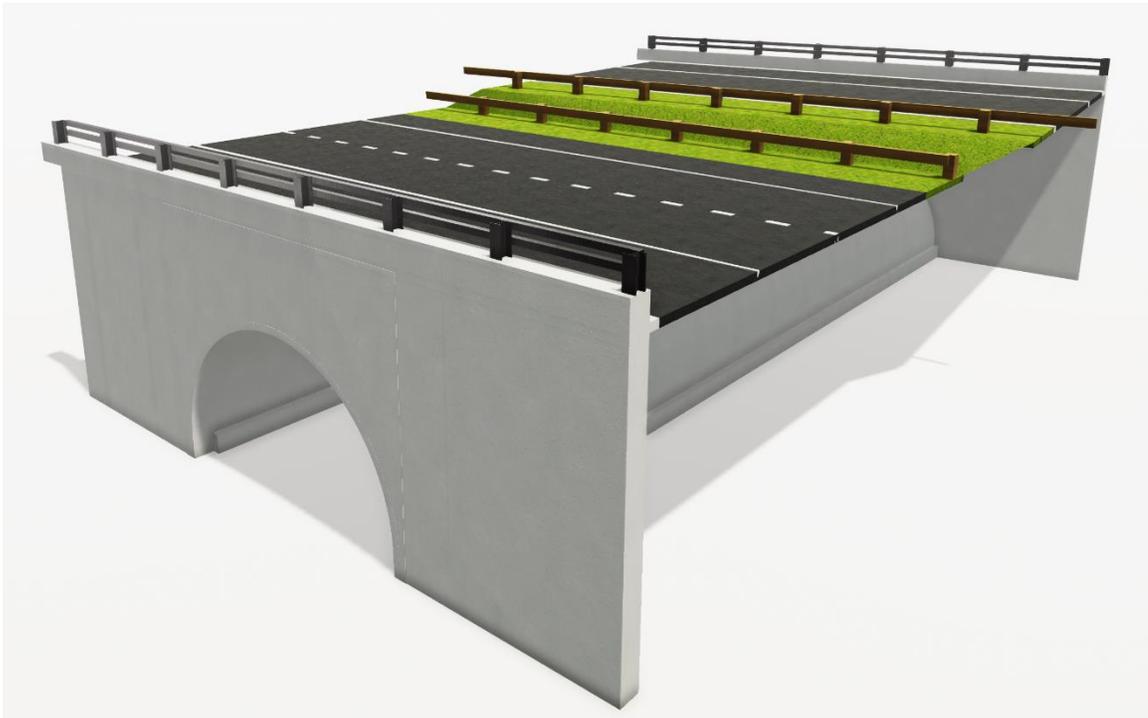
Jamestown Arch III, 3D-Model Overview, View to North-West (own figure)
